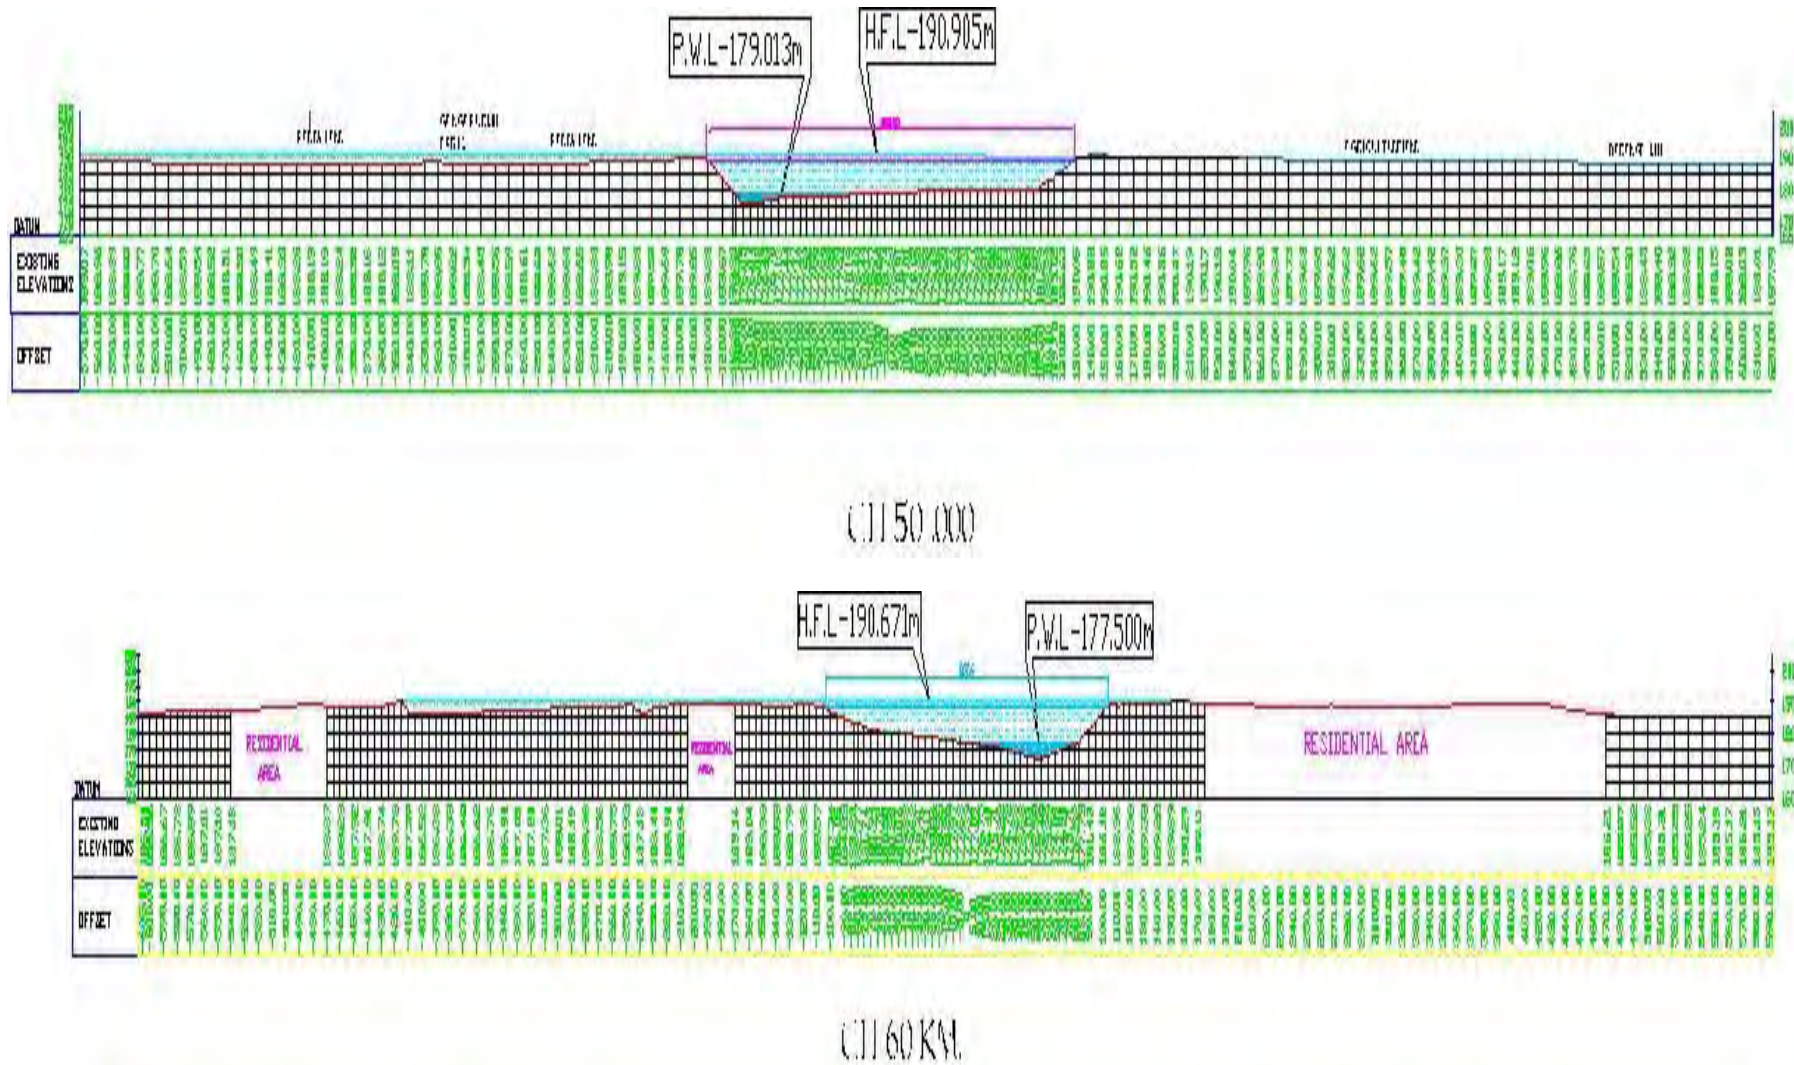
(c) Section Details of Barak River upto 500m in the countryside
